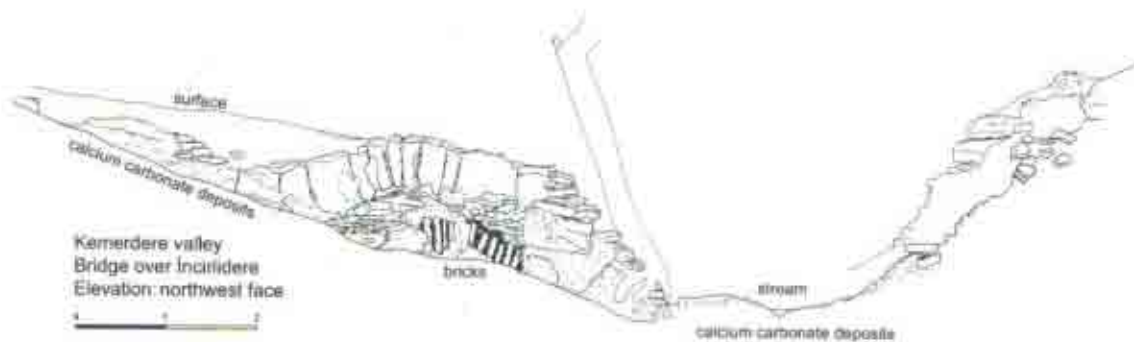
Elevation of the small bridge on the Inciridere, northwest face. Illustration by Rüstem Aslan and Sinan Kılıç.
